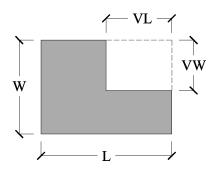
Parameters to define the size of a shoe shape rooms in the floor plan.
